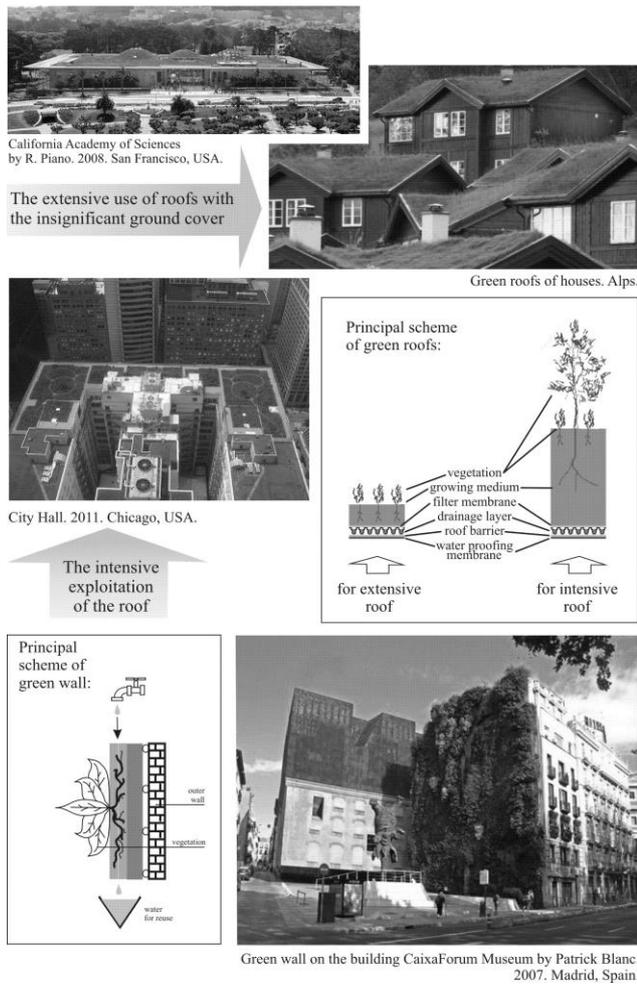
Use of roofs and walls of buildings under planting of greenery
